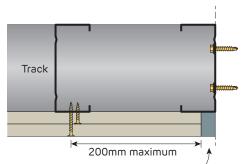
Sliding Connection EC4 Universal Bracket (UB60 or UB80) Section
